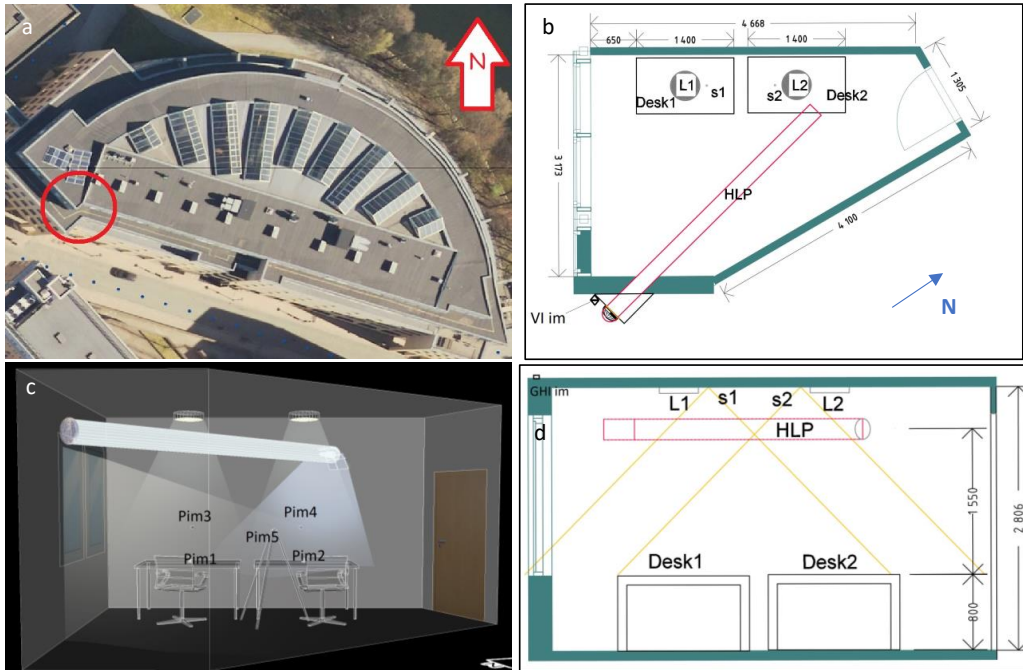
Full-scale test office. a) Situation plan of the Norconsult Headquarters in Sandvika; b) plan of the test office, VI im is the outdoor vertical illuminance meter; c) model of the office with sources of illumination: window, HLP, and luminaires; Pim (1 to 5) show the position of the five indoor illuminance meters; d) section the room, Desk 1 is closest to the window and desk 2 is closest to the door. The HLP exit is near the desk 2 and the custom-designed reflector direct the daylight to the desk 2. Desk 1 is to be lit by artificial lighting from luminaire 1 (L1), and desk 2 from luminaire 2 (L2). S1 is the DLC sensor connected to L1, and S2 is the sensor connected to L2. GHI is the outdoor illuminance meter on the roof.
